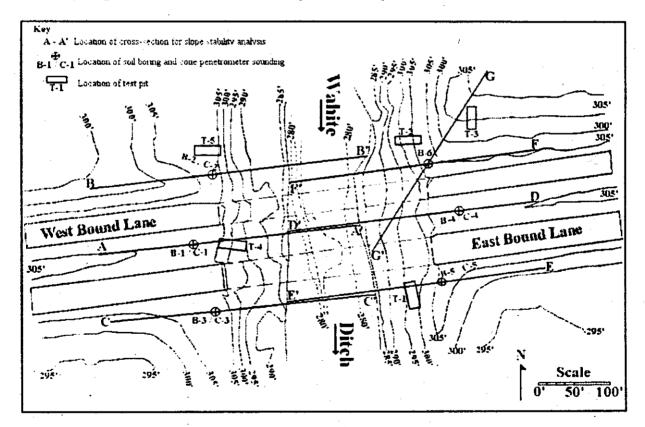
Wahite Ditch Site Topography, Cross-Section and Boring Locations
